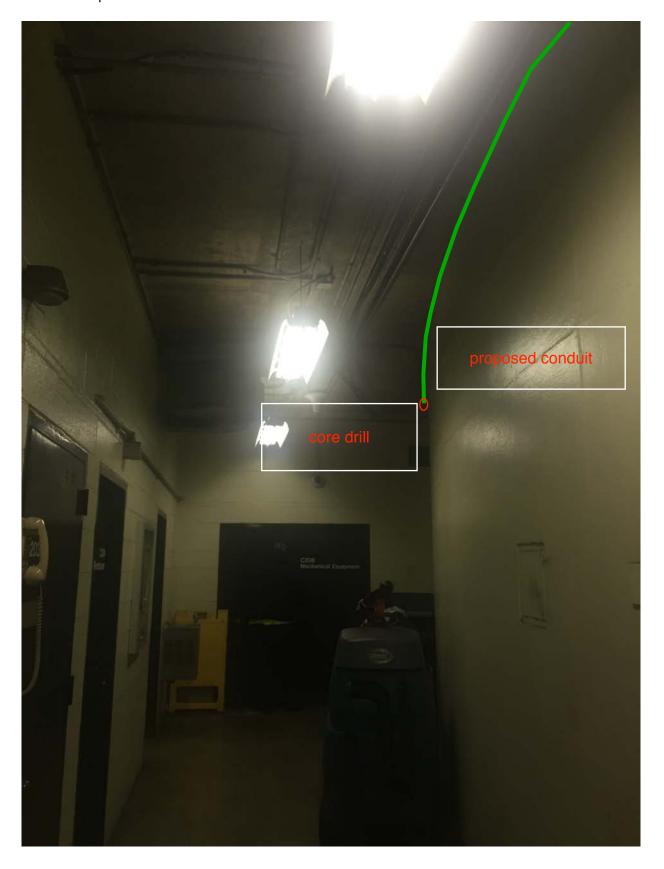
G02 Capitol Heights: Proposed conduit along ceiling of AFC panel room
